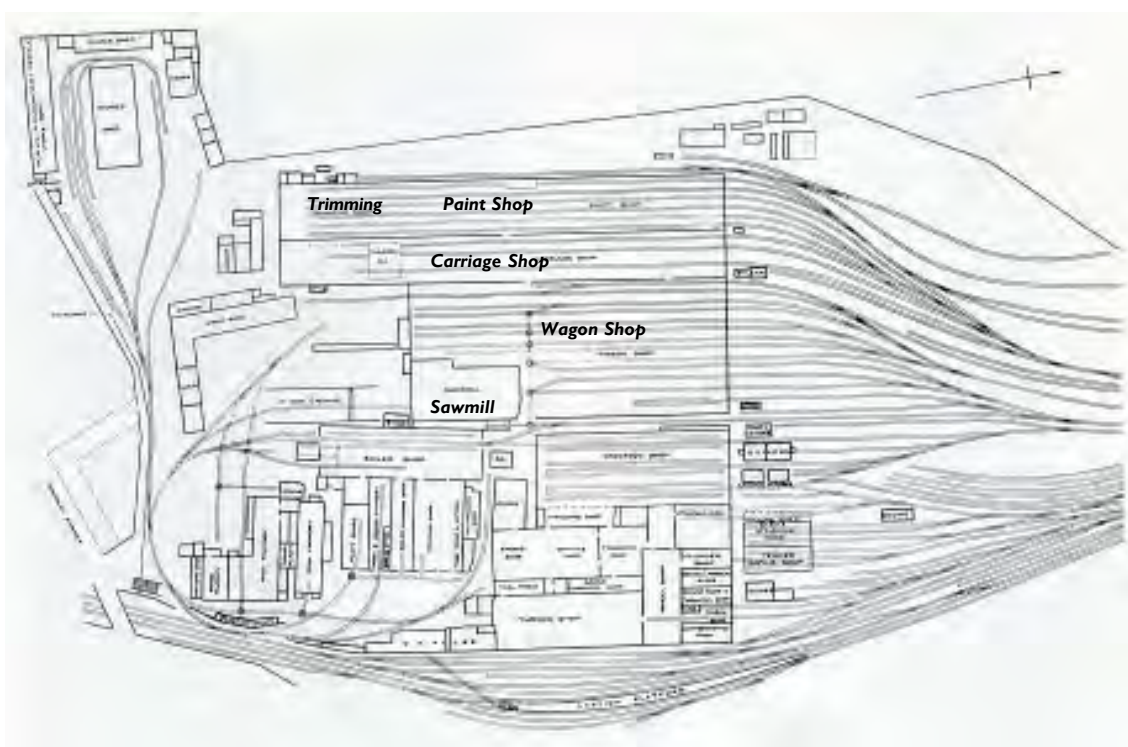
Cowlaers Works. The Paint Shop/Trimming Shed, Carriage Shop and Wagon Shop are at the top of the plan. They all have longitudinally arranged rails. A fan of rails similar to that at Eveleigh Carriage Works provides access to the shops. Source: 'An Illustrated History of British Railways' Workshops' p 38.
